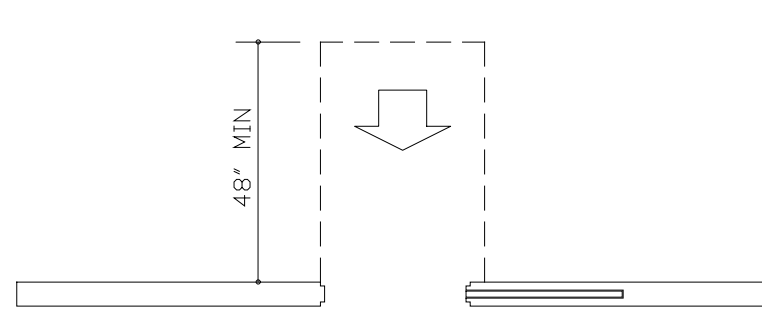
FRONT APPROACH SLIDING AND FOLDING DOORS
